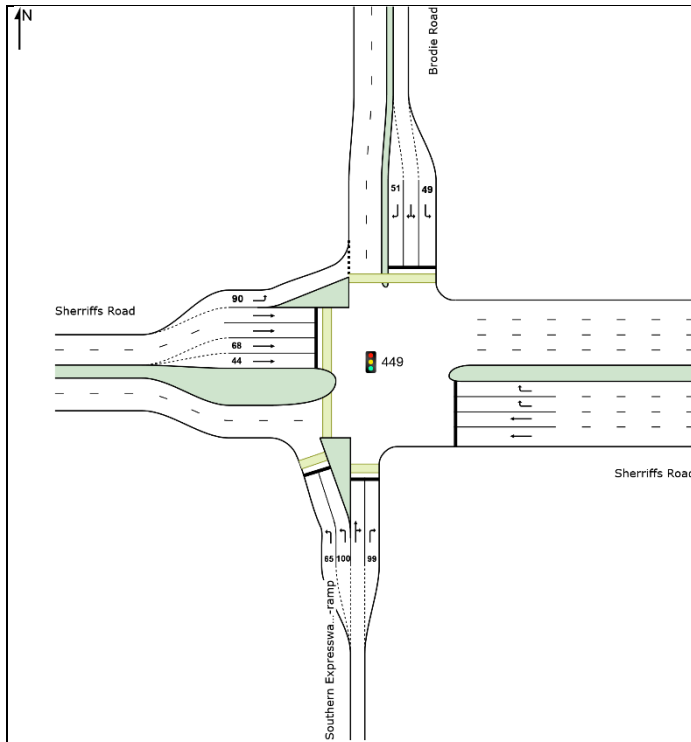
TS449 Sherriffs Road – Southern Expressway Ramp Site Layout
